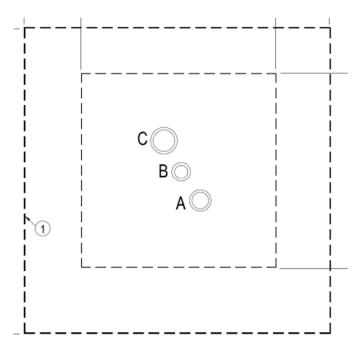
Plastic pipe with PROMASEAL® FC 40 – 65 collars (floor underside plan view)
